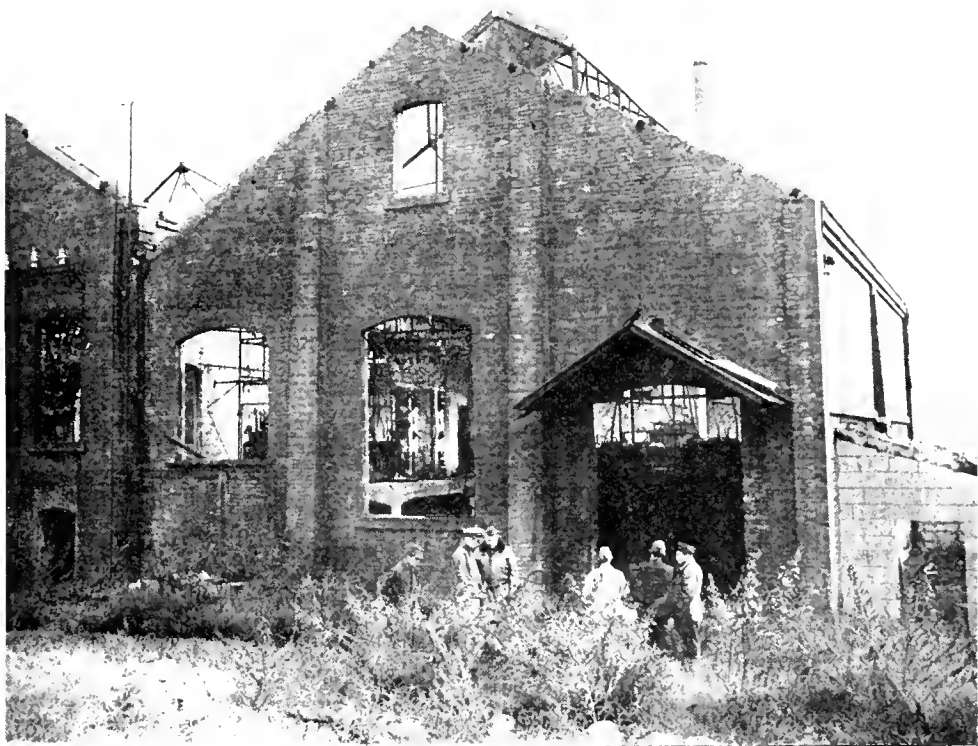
Sugamo substation—Rear view of building. Transformers and switch-board showing are completely destroyed
